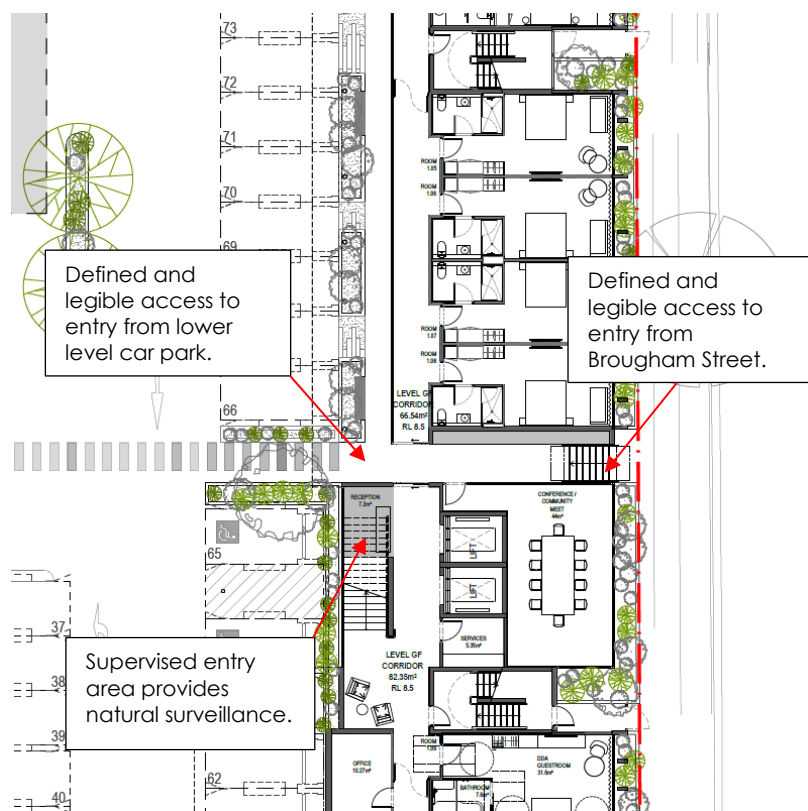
Extract from Lower Level Parking Plan (Source: loopcreative, 2023)
